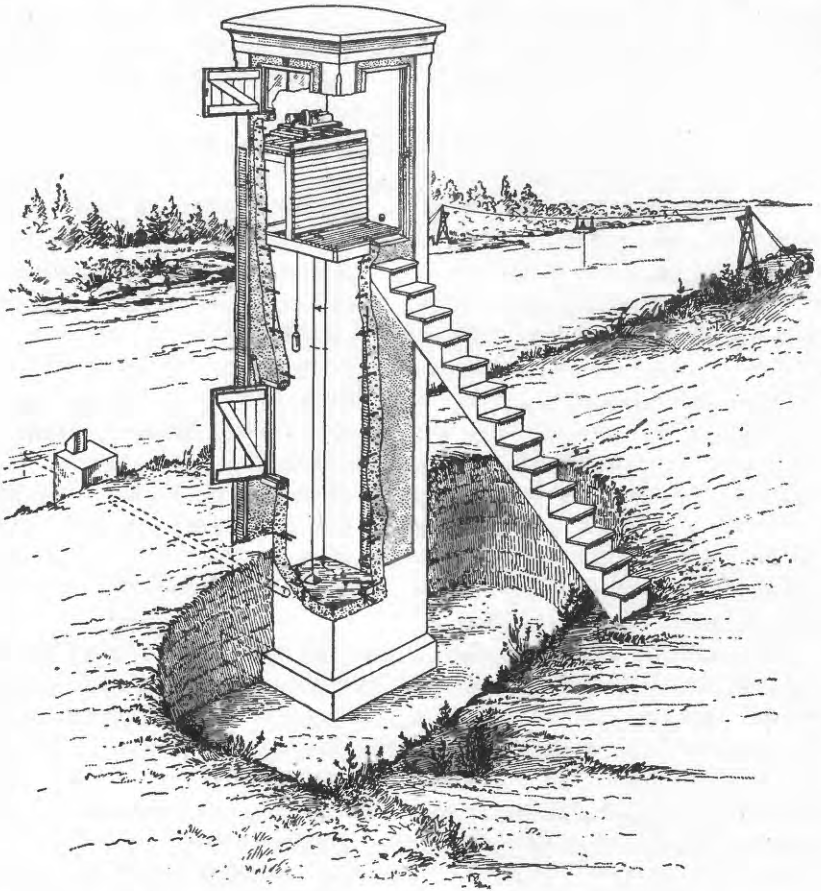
Typical river-measurement station showing concrete well and house for water-stage recorder and staff gages, cable, and car.
